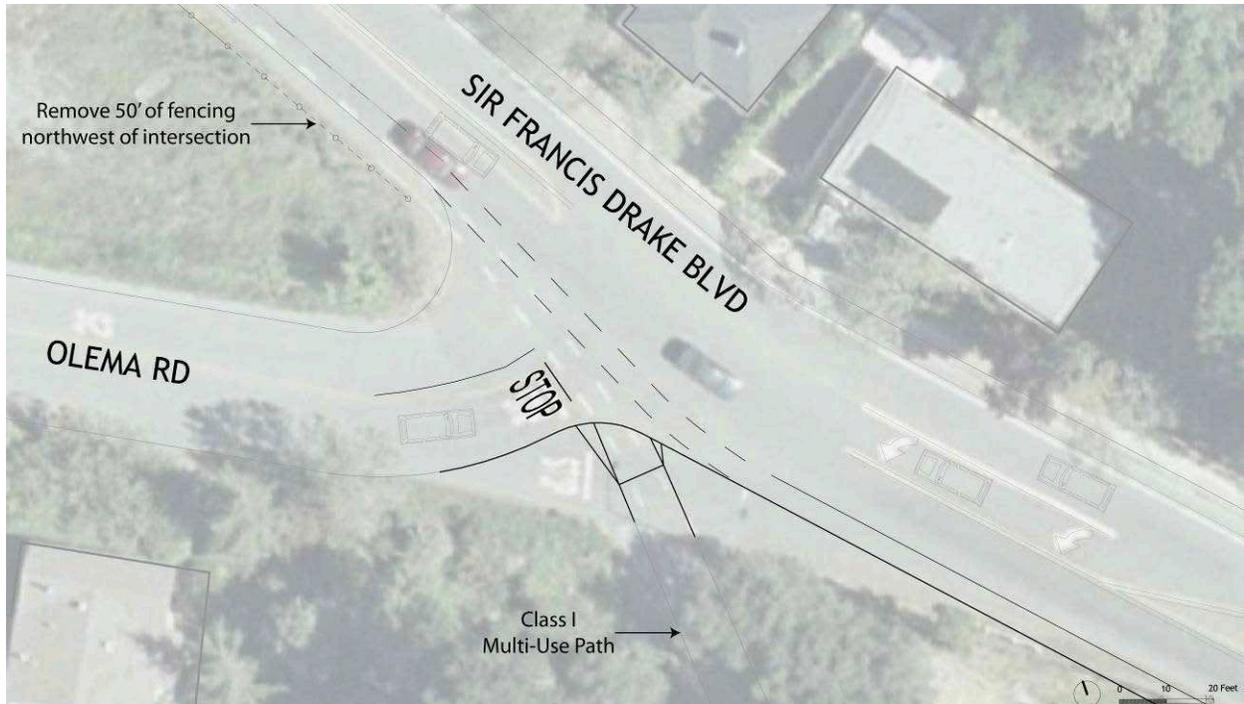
Plan View of Proposed Improvements for Project 3: SFD/Olema Road (east)
